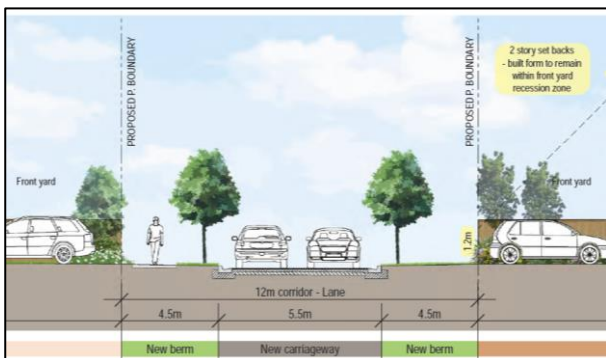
Example of Typical Local Road Cross Section (12m Corridor)
